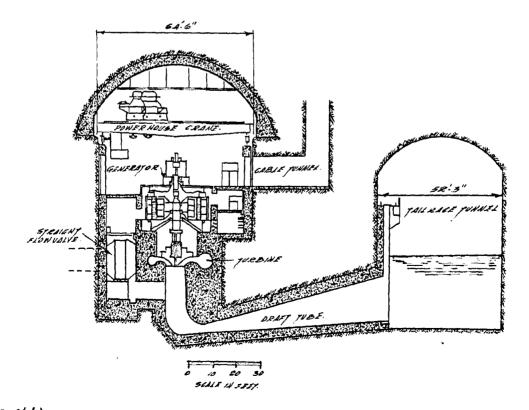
(d) CROSS SECTION OF BERSINIS NO: 1 POWER HOUSE AND TAIL RACE TUNNEL.
